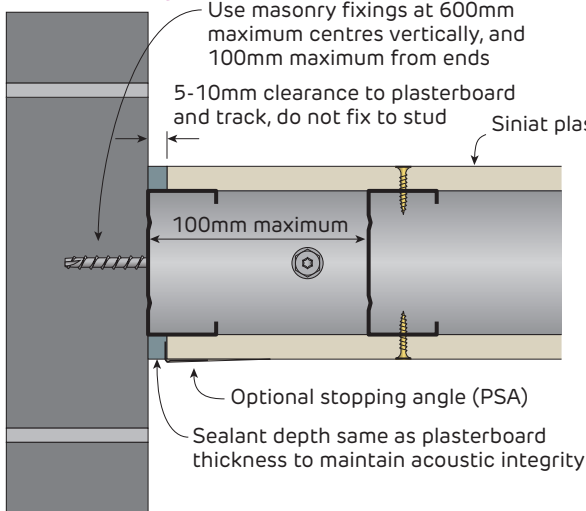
Sliding Wall End to Intersecting Wall Plan
